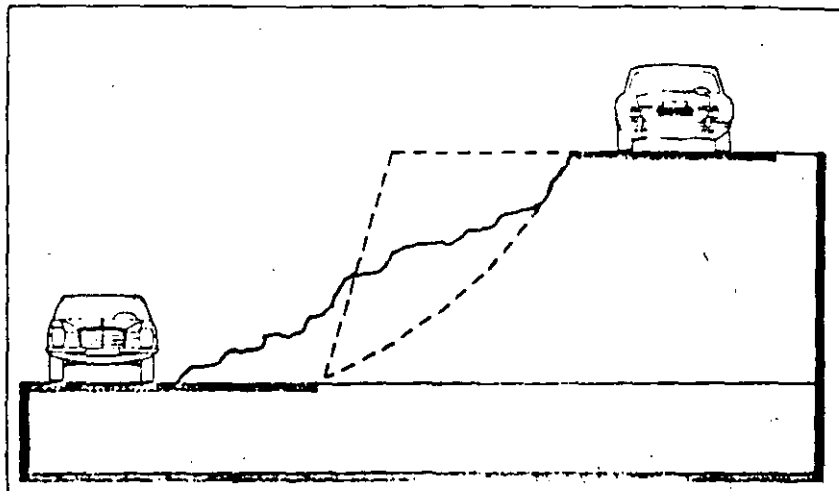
Failure mechanism of earth retaining structure, acc. Rankine
